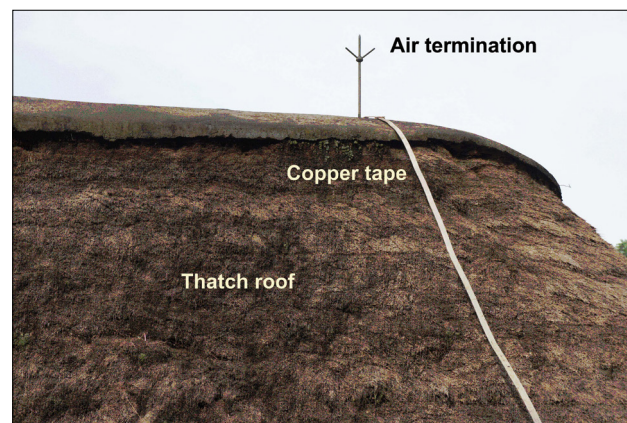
Thatch roof structure showing the down conductor of a lightning protection system resting on the roof.
